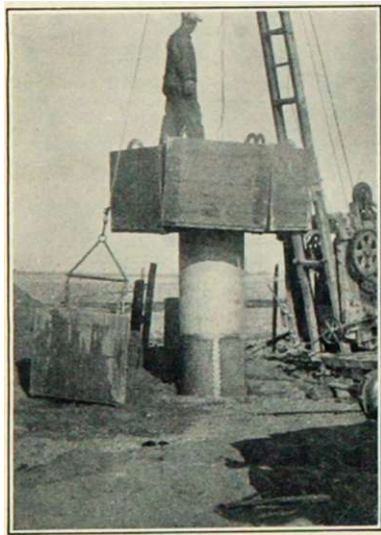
Detachable sand boxes used for forcing casing. Orange-peel bucket equipment being used.
